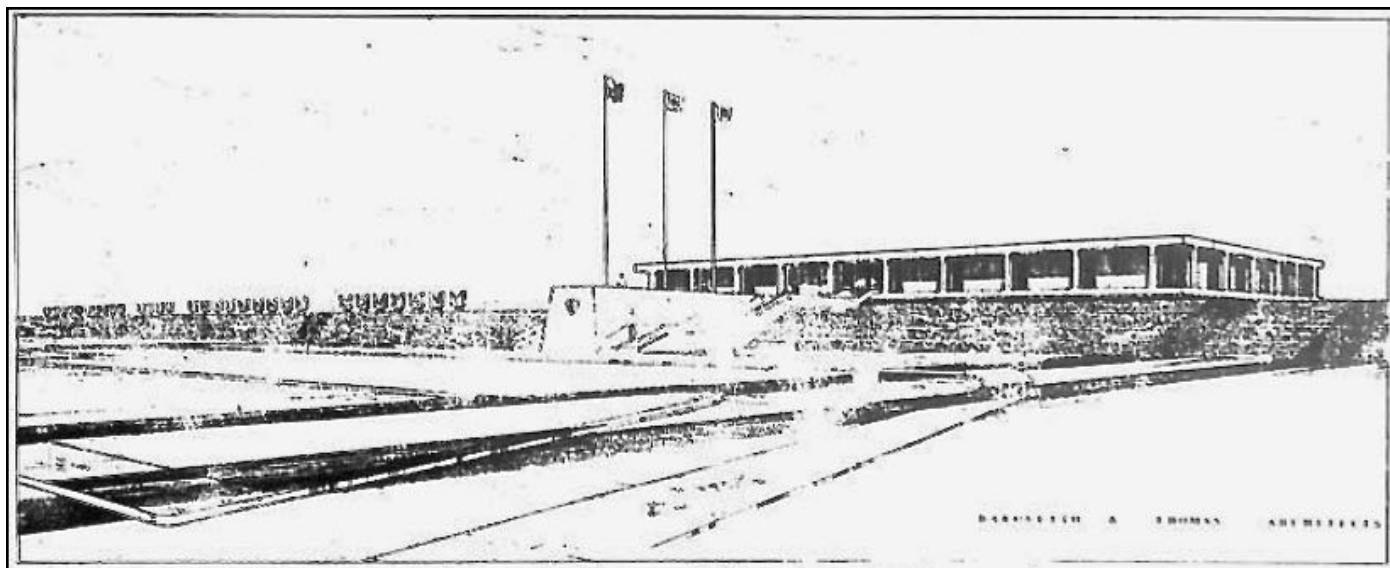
Architectural sketch showing the building, promontory, and company sign atop the revetment.
